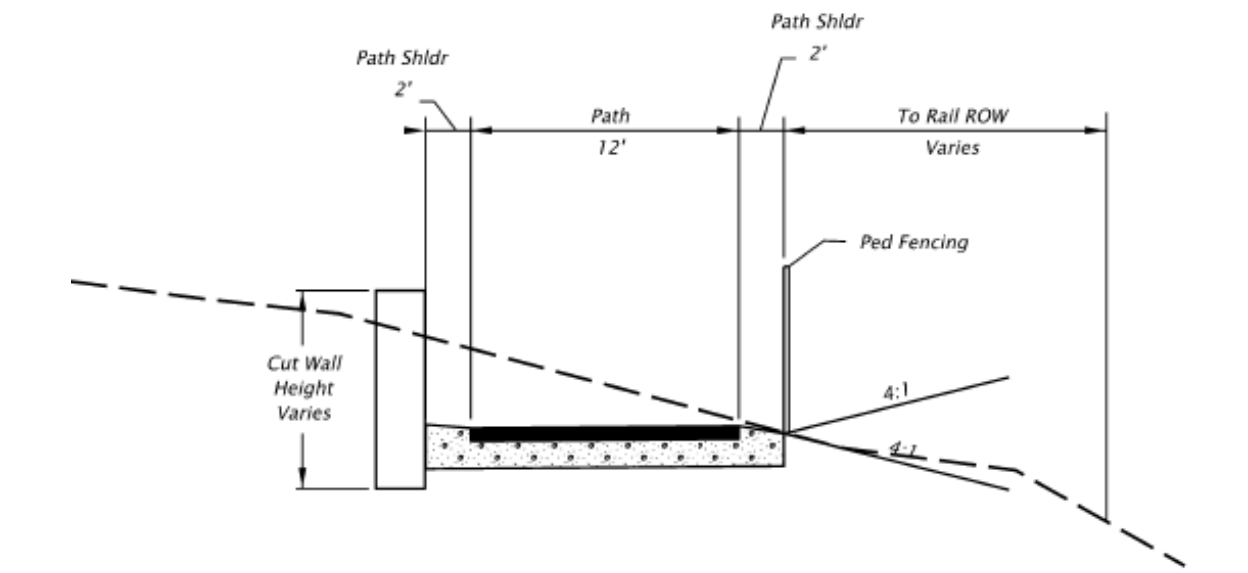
Alternative A2 Retaining Wall Typical Cross Section
